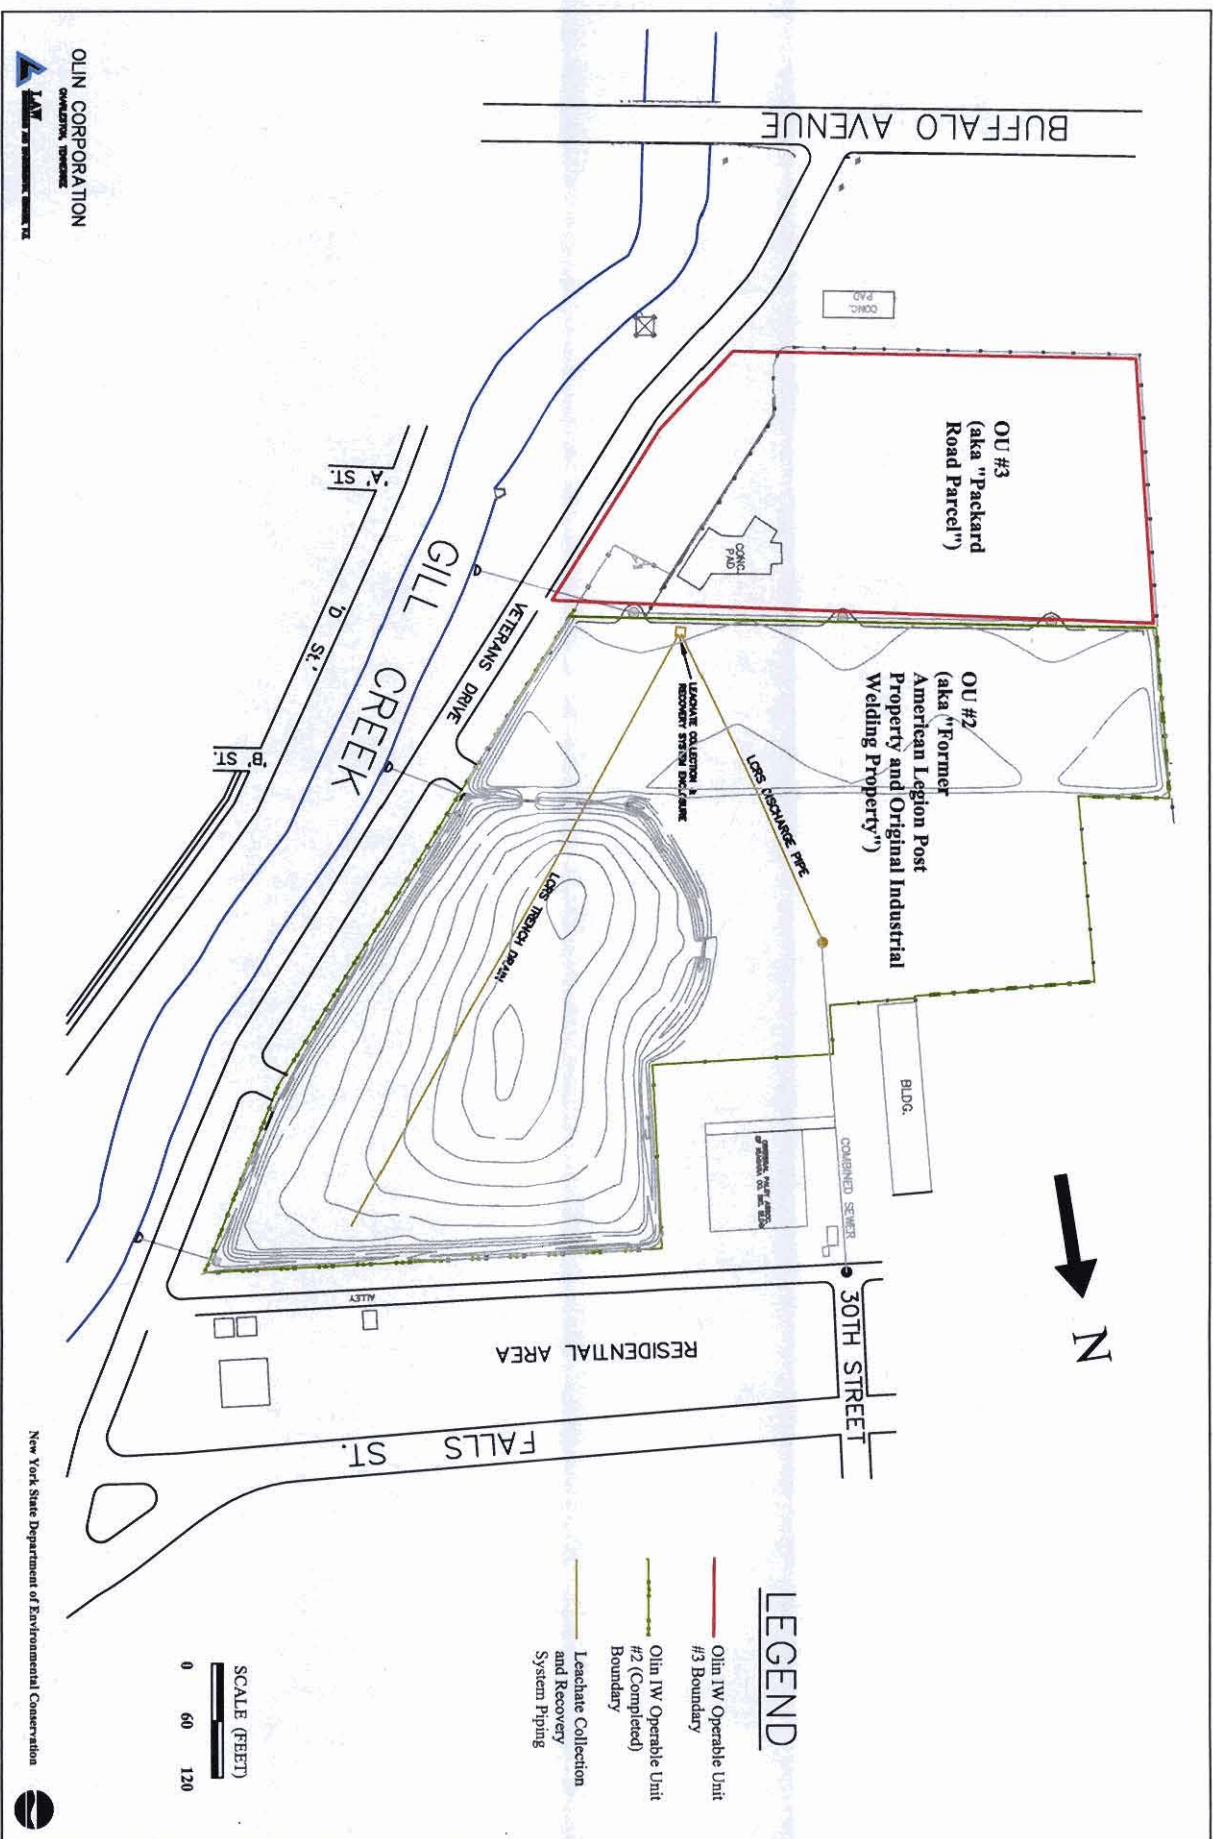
Olin Industrial Welding Site (#932050)
